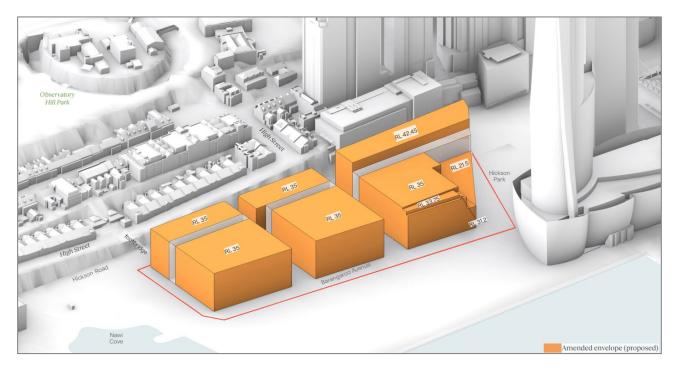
PROPOSED CENTRAL BARANGAROO BUILDING ENVELOPE (SJB)
